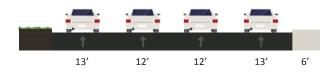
Brorein Street Typical Cross-Section, between Florida Avenue and Morgan Street
